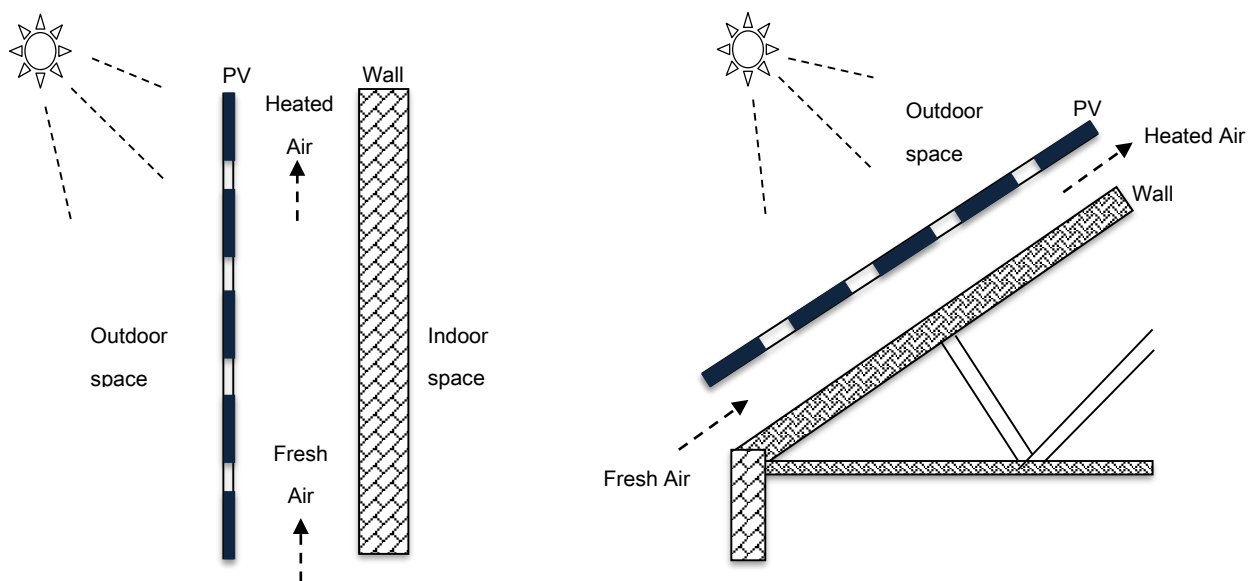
Schematic diagram of the BIPV system investigated, in vertical position (façade installation) and inclined position (roof installation).
